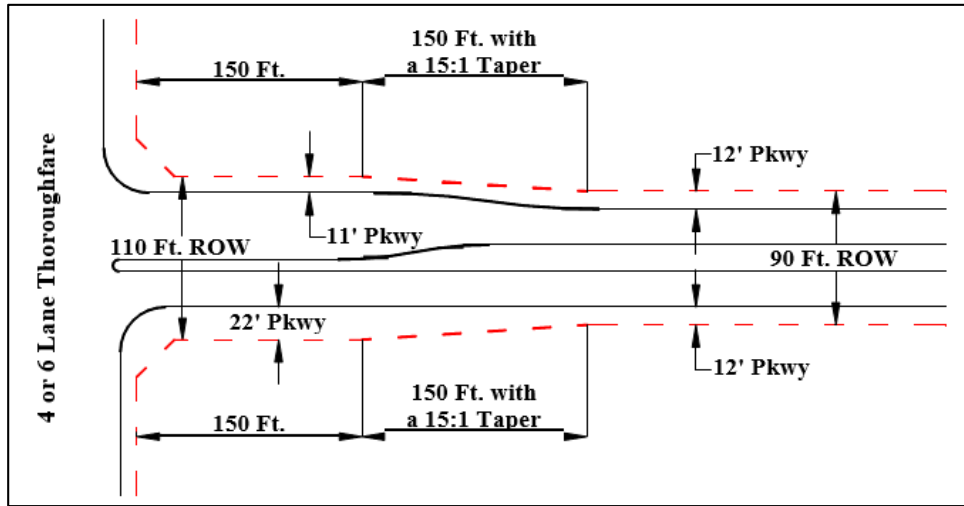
Minor Intersection Detail (4LD Thoroughfare)
